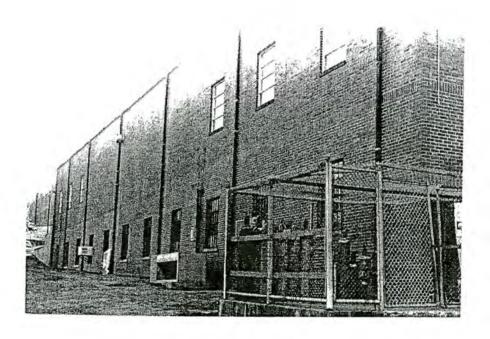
B.H.H.D., Recommended Boundary Expansion, Hooper Building, West Elevation, Looking Northeast.
